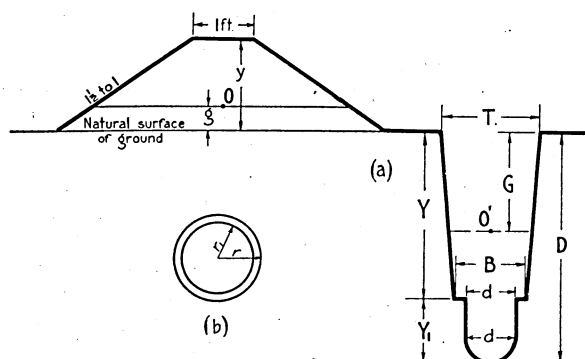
Typical Cross-Section of Spoil Bank and Tile Trench for Tile Less Than 10 Inches in Diameter
